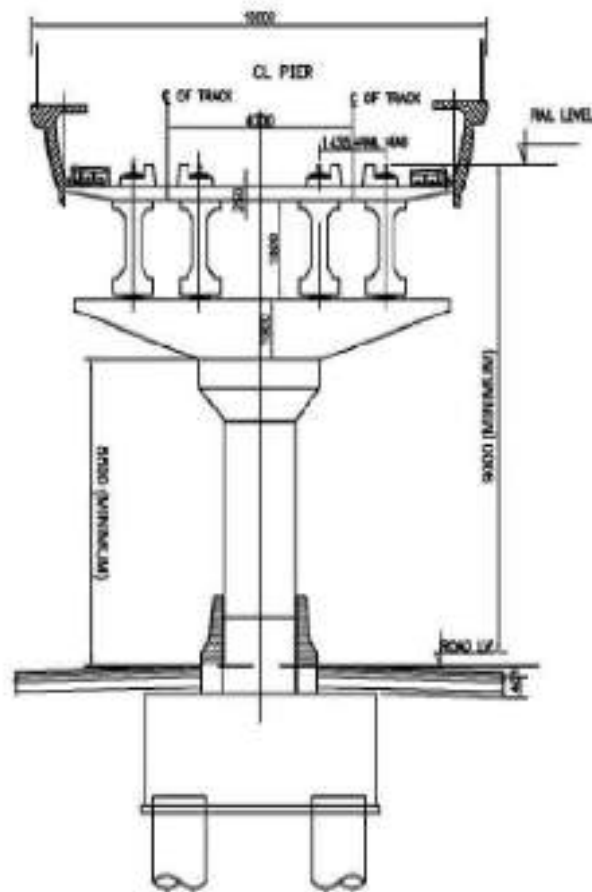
showing the cross-section of Box Girder Viaduct Section
